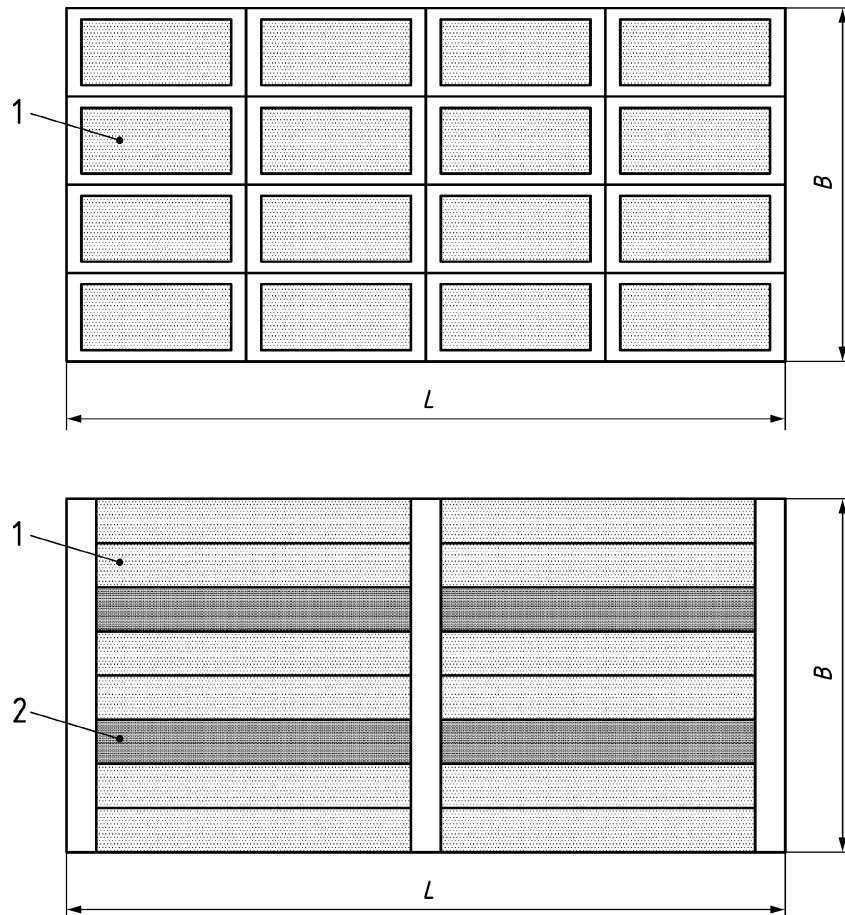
Section of a ceiling mounted heating surface with single modules in a ceiling grid
